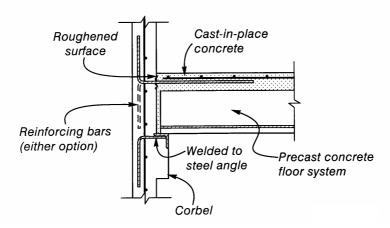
Exterior wall-floor slab connection detail: Continuous wall with armoured corbel
